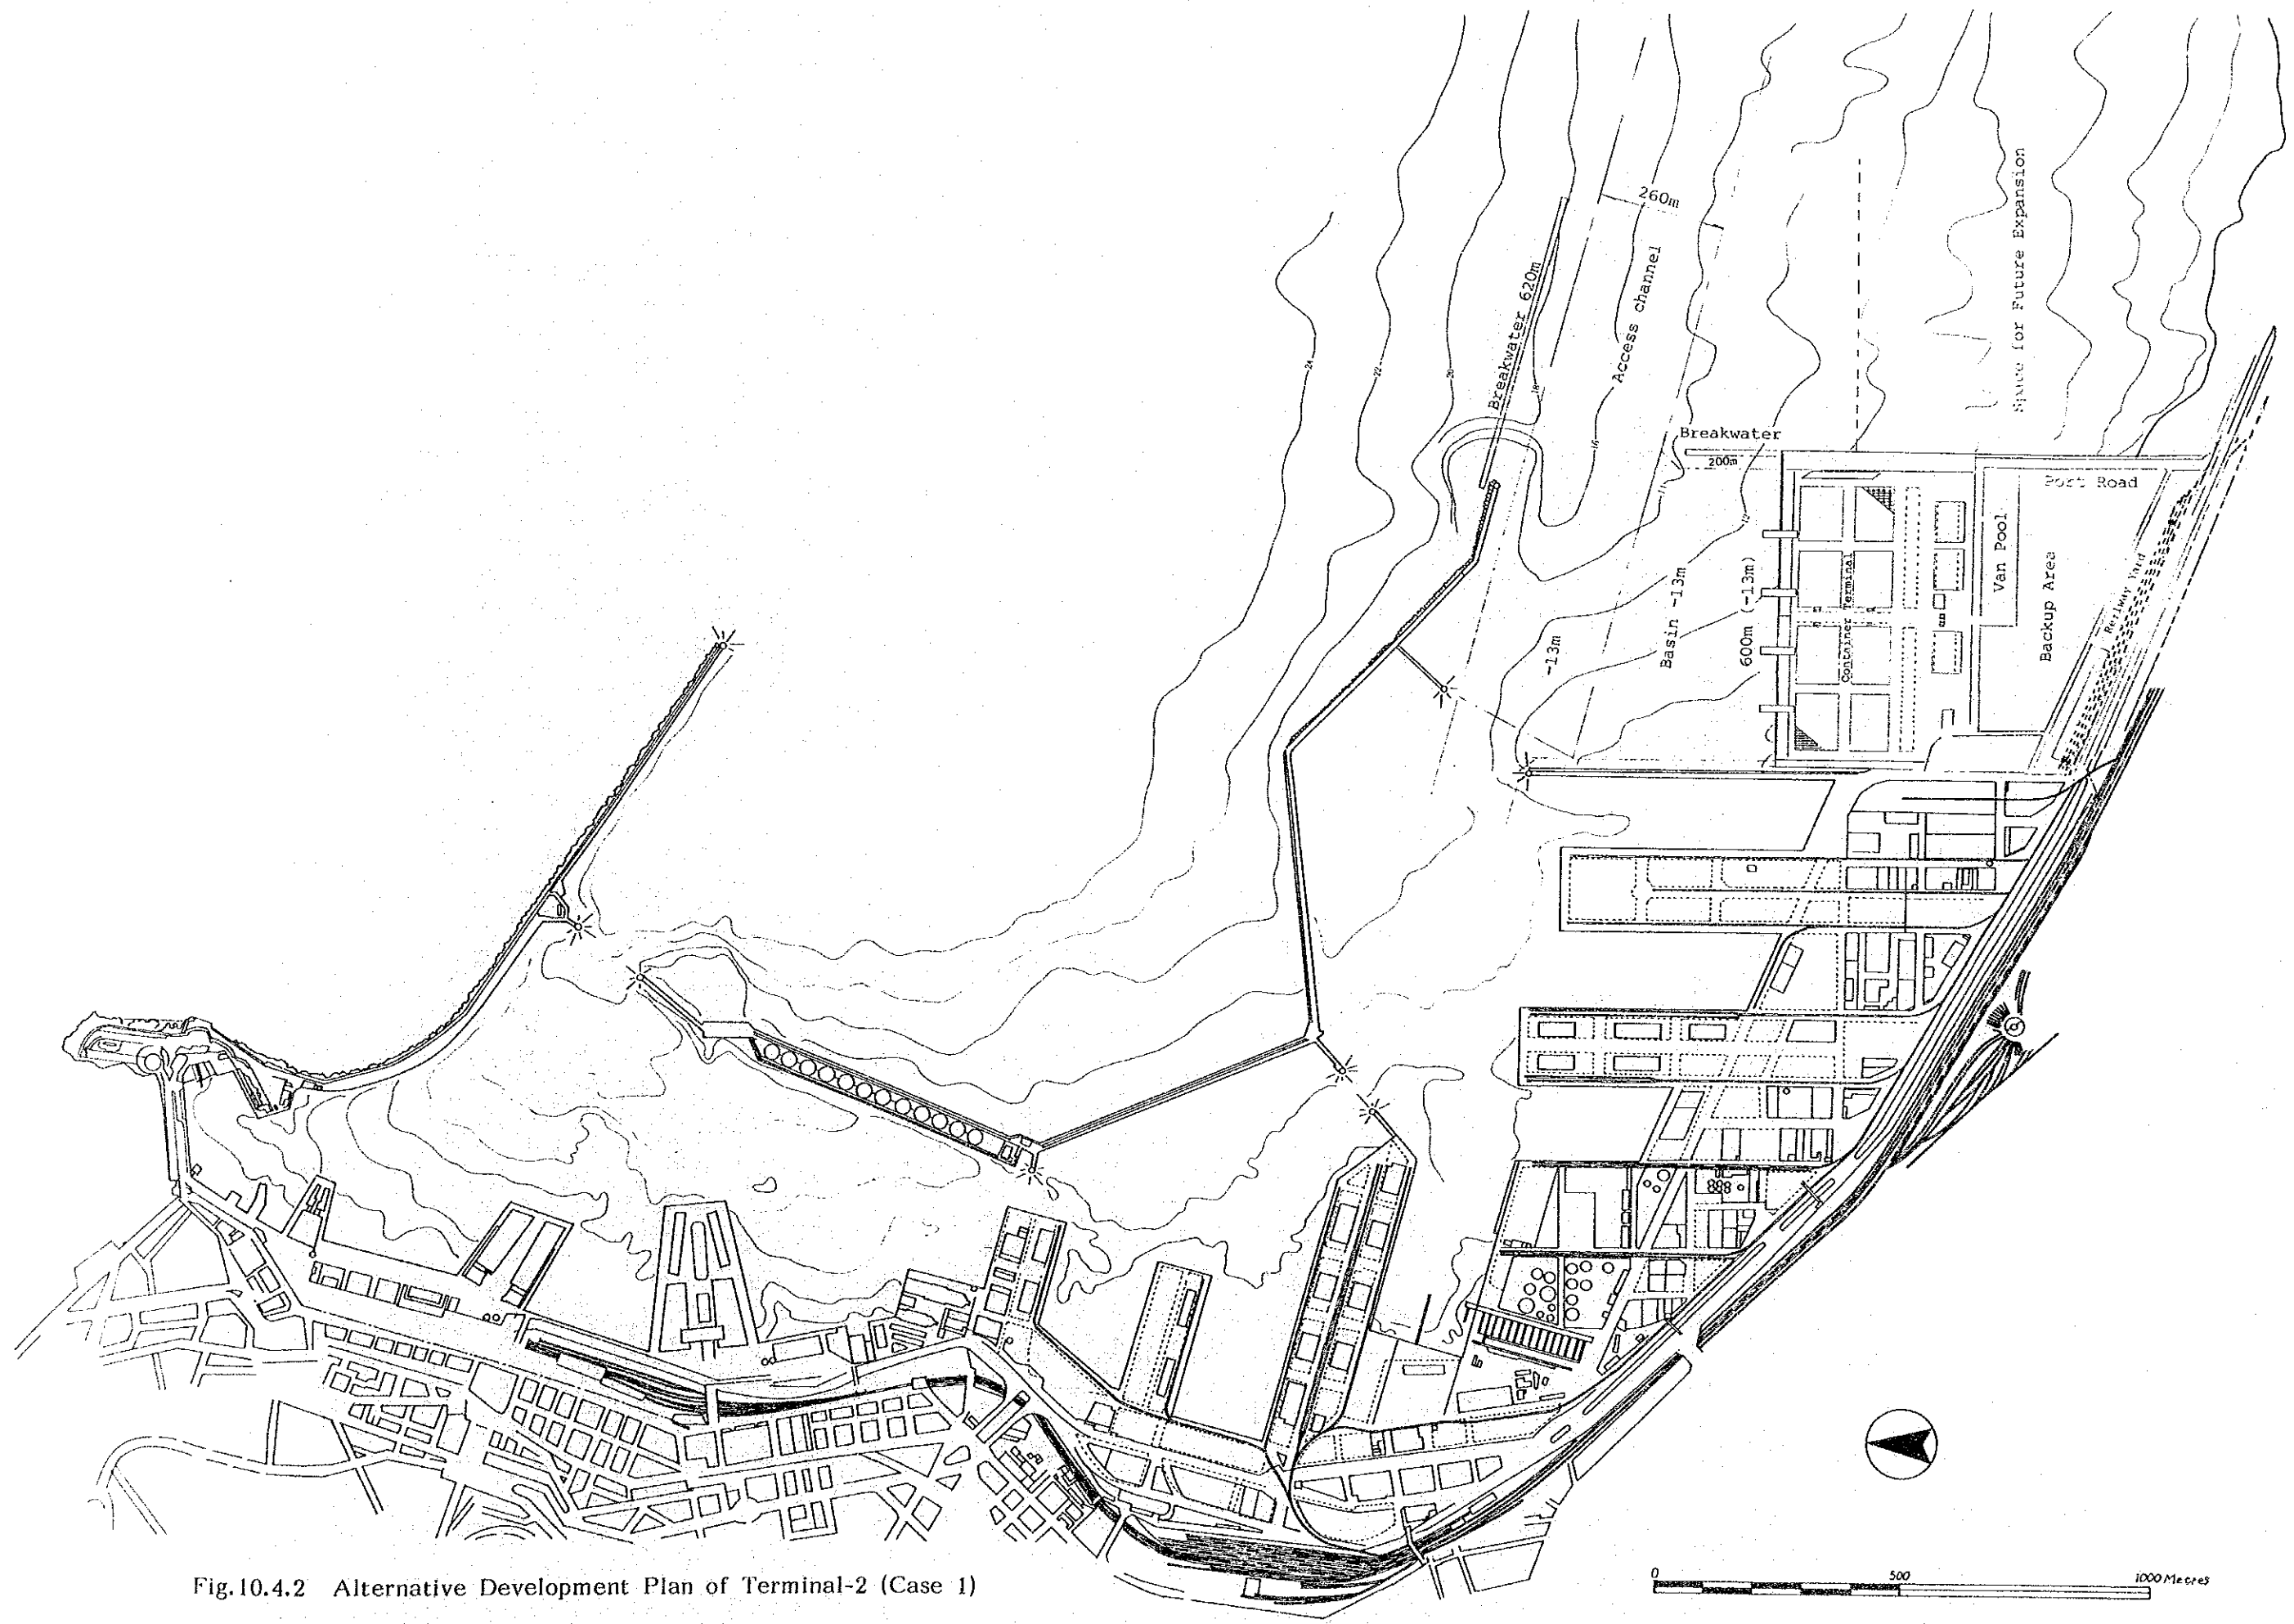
Alternative Development Plan of Terminal-2 (Case 1)
